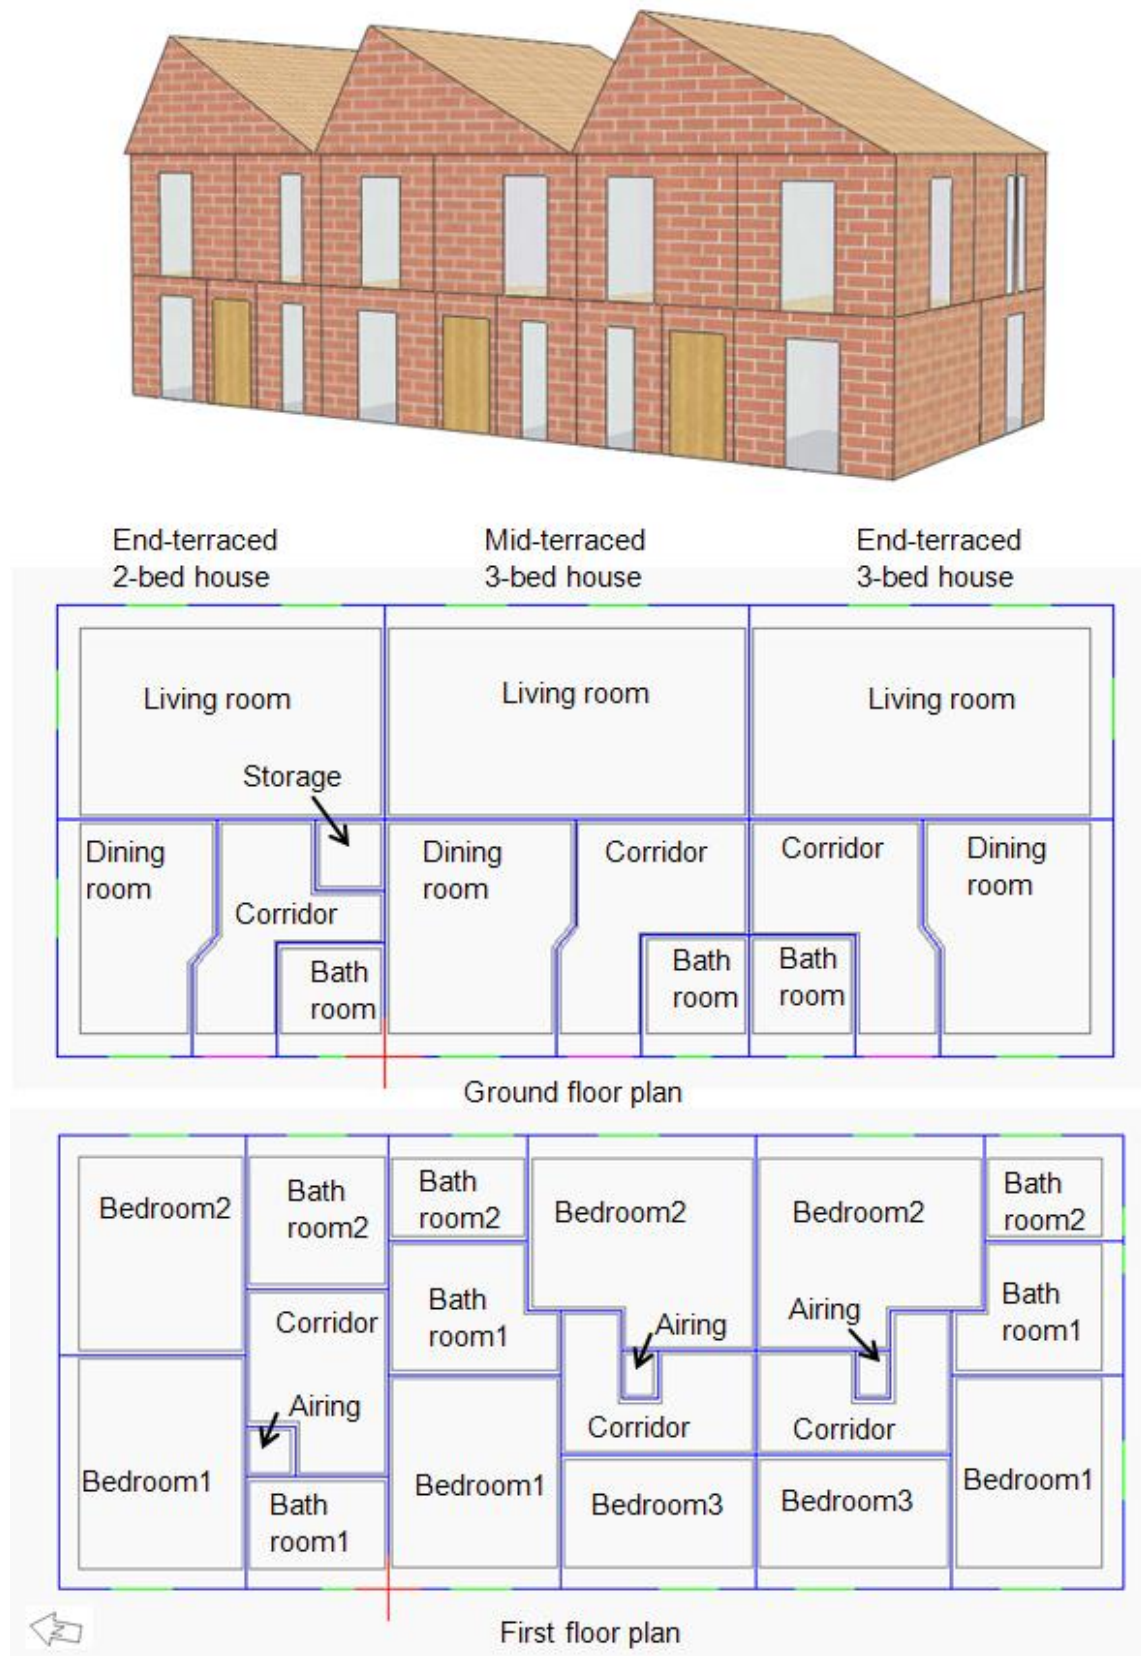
IES model of 3-bed mid-terraced and end-terraced house and their floor plans
